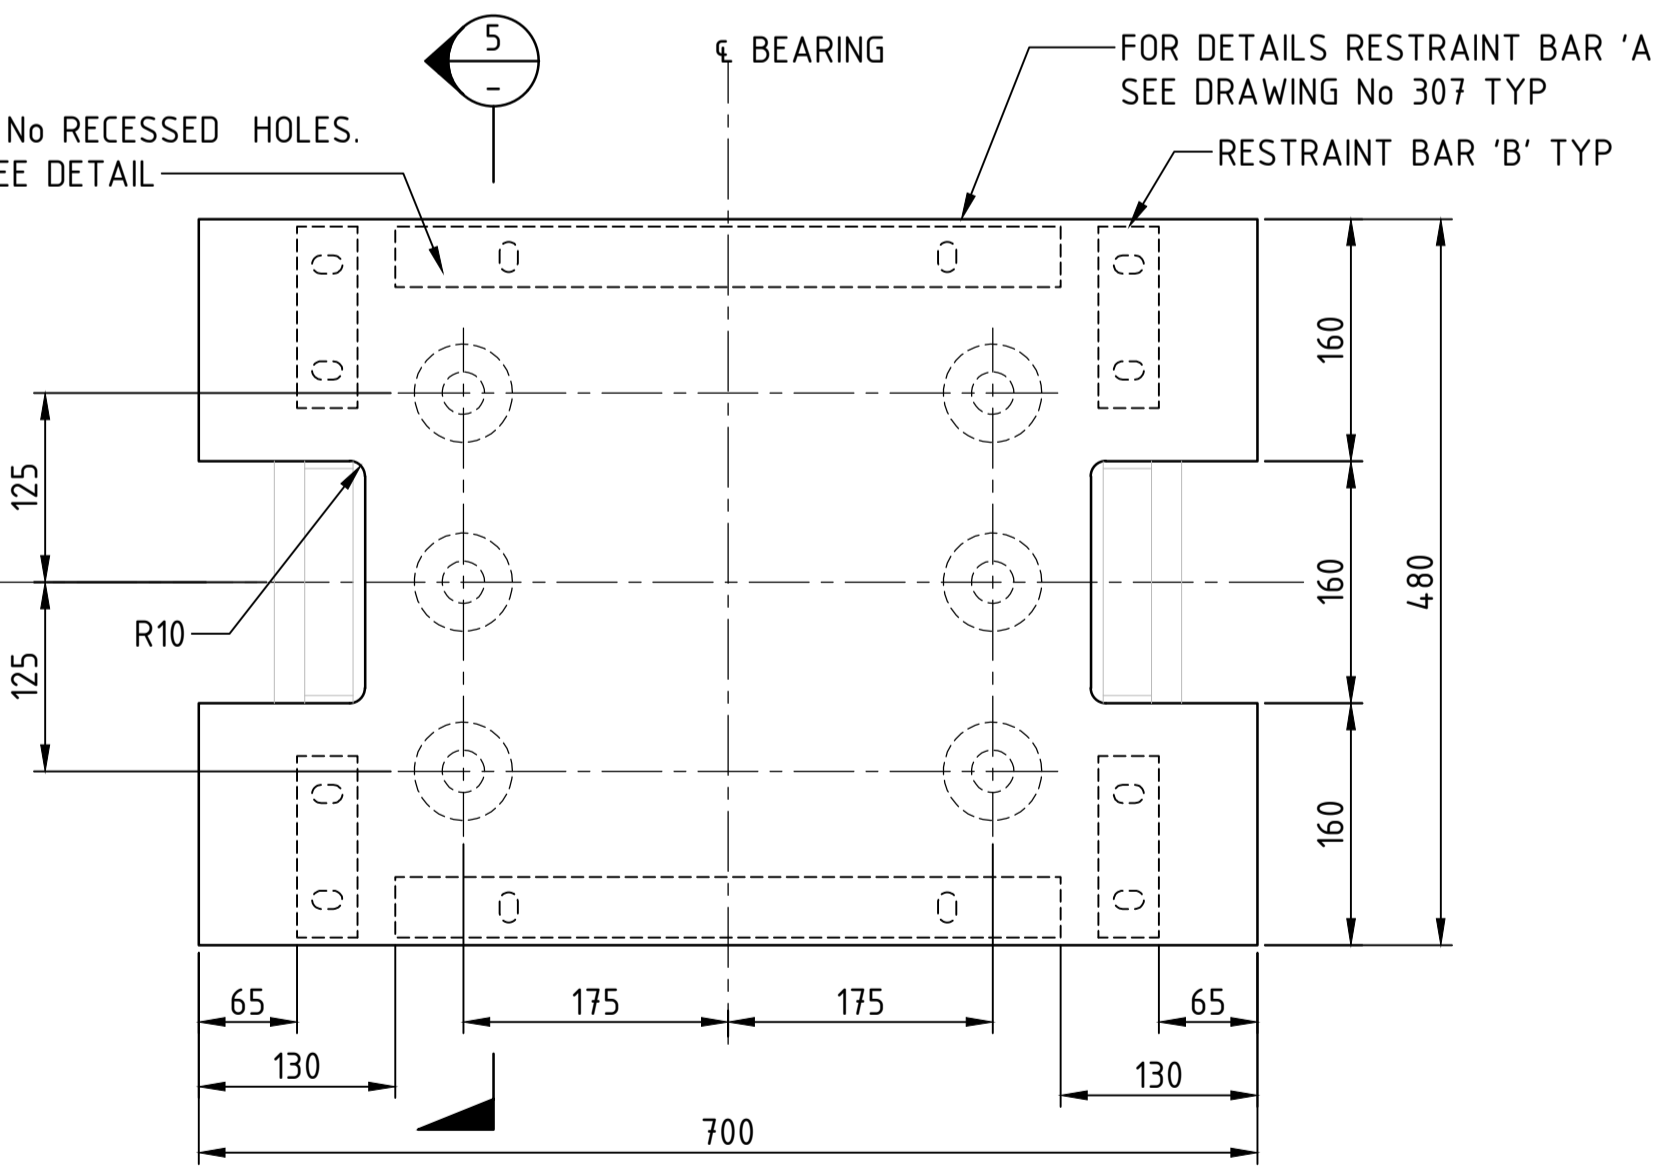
DETAIL SHOWN FOR TAPERED TOP PLATES RECESSED HOLE DETAIL FOR LOWER ASSEMBLY SIMILAR
